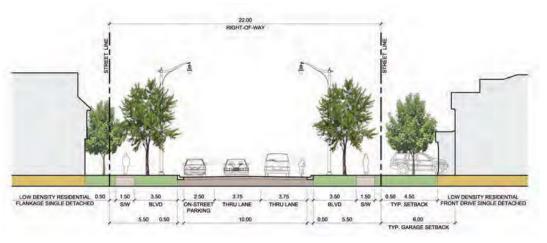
Conceptual typical treatment for Collector Roads A, B, C, D, E, F (south) and G (22.0m ROW) with 2 thru lanes, on-street parking on one side and street trees in grass boulevard.
